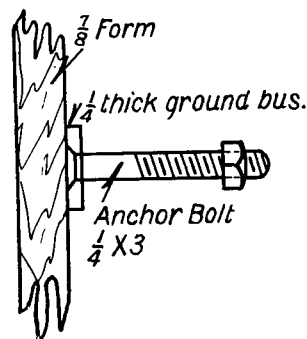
Method of Anchoring Ground Bus Into Concrete
